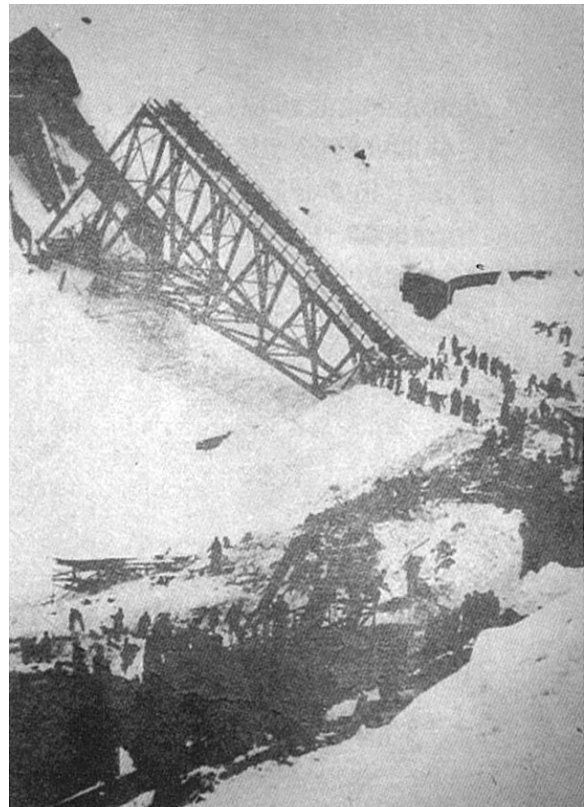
Damages on Rebolledo bridge caused by the avalanche of 1944 (source: León, 2003).
